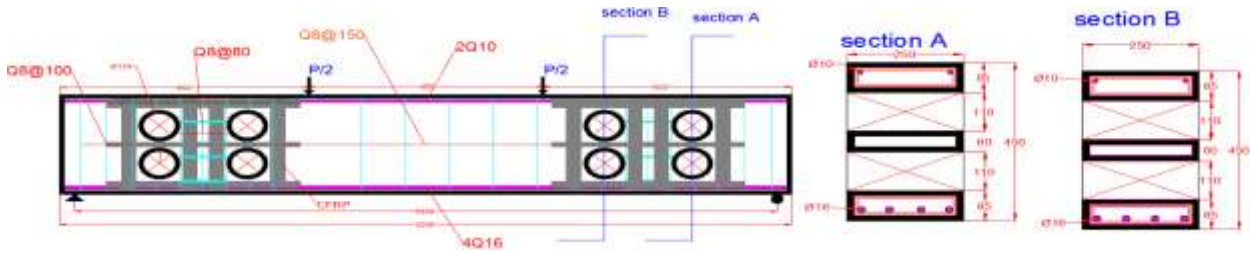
Detailing of beam with eight circular opening strengthened with CFRP.
